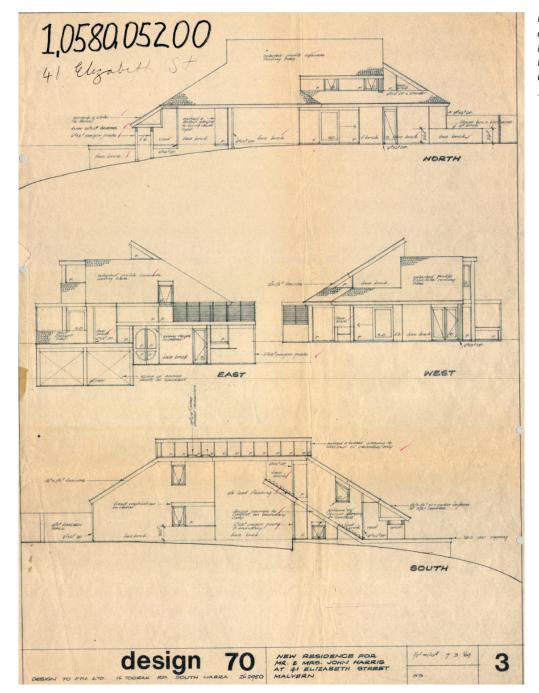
Architectural elevations for 41 Elizabeth Street, Malvern by Cocks and Carmichael, 7 March 1969 (SHC)
